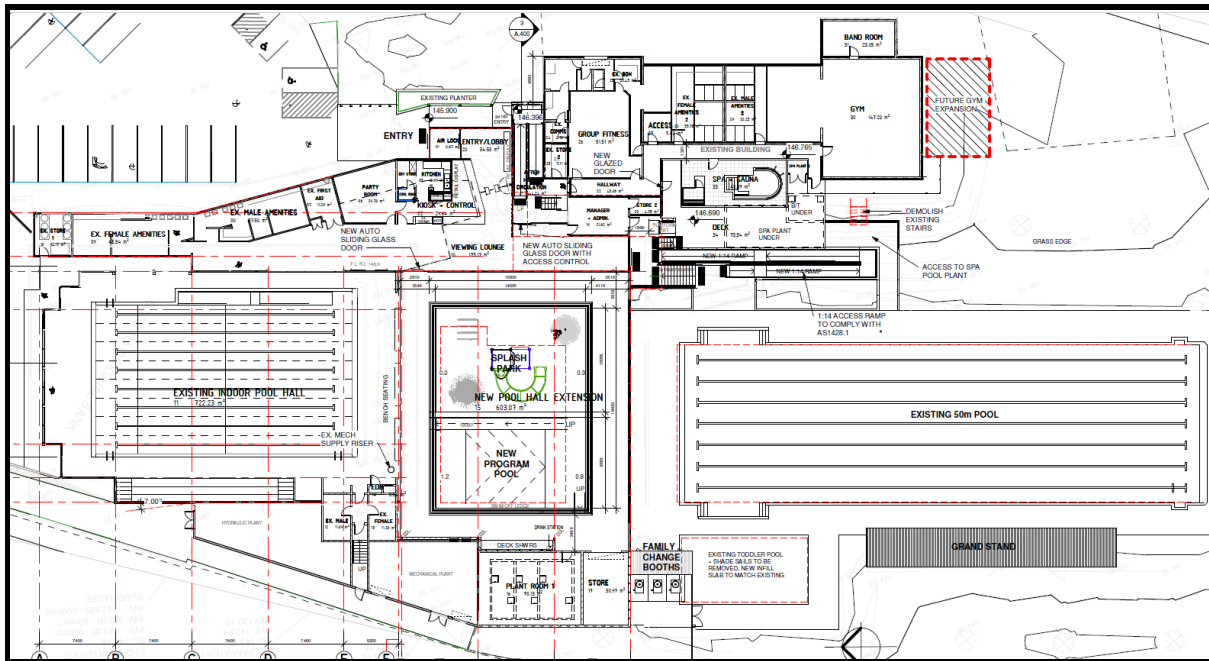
The Proposed Development (Source: Facility Design Group, 22 January 2019)
